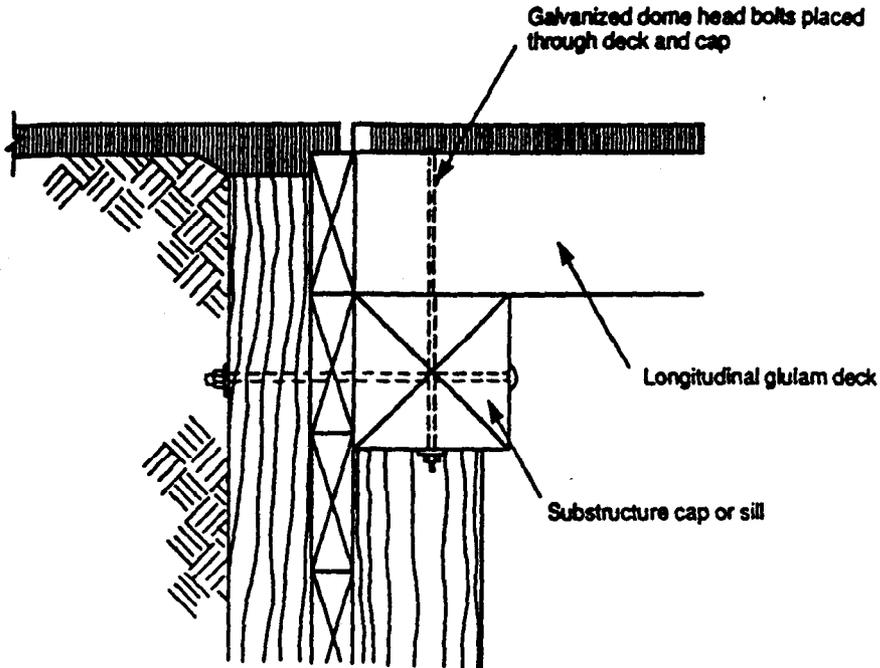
Typical bearing configuration for longitudinal glulam timber decks.
